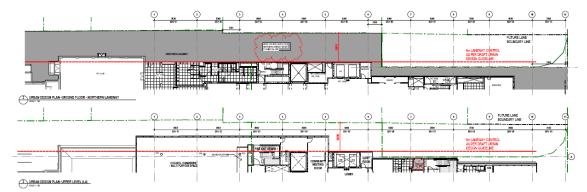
Northern laneway alignment at ground and upper level with overhang (Source: extract of DA-1610)
